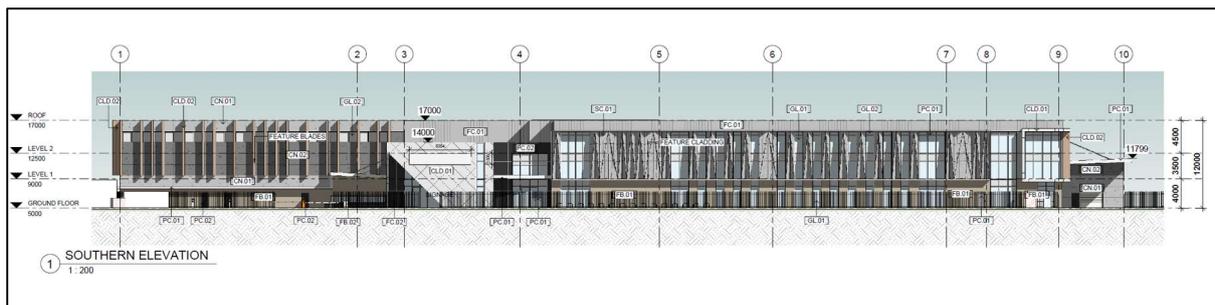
Southern Elevation. Source: EJE Architecture (May 2024)
